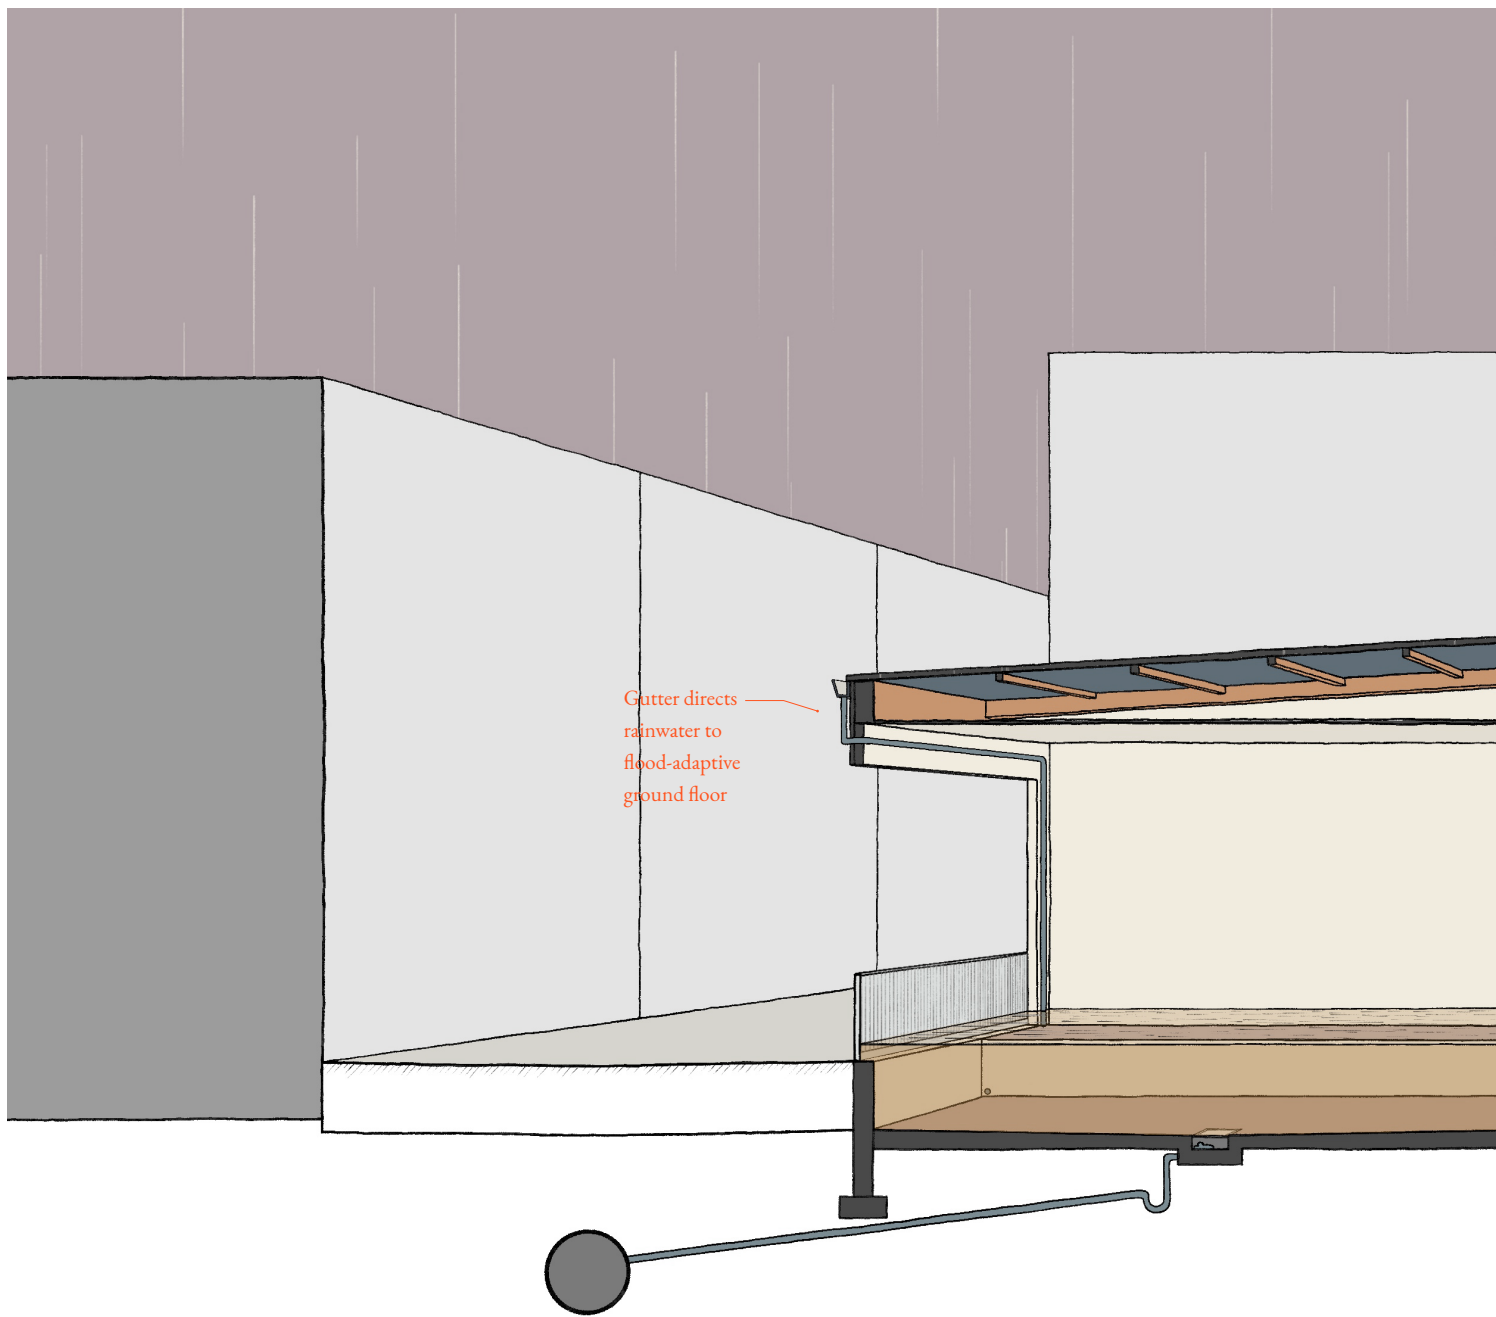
Plan of retrofitted alleyway house without front yard in flood condition.
